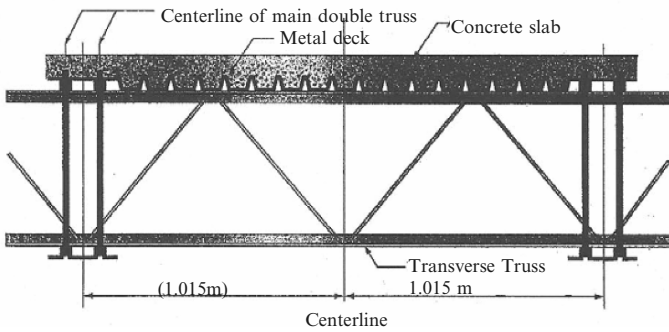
Cross-section to main double trusses supporting concrete floor
